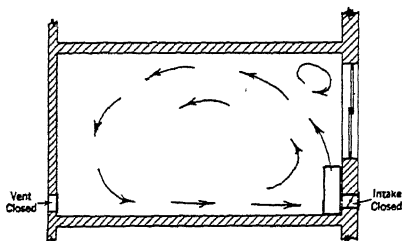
SECTION THROUGH A UNIT CONDITIONER EQUIPPED ROOM WHEN COOLING
